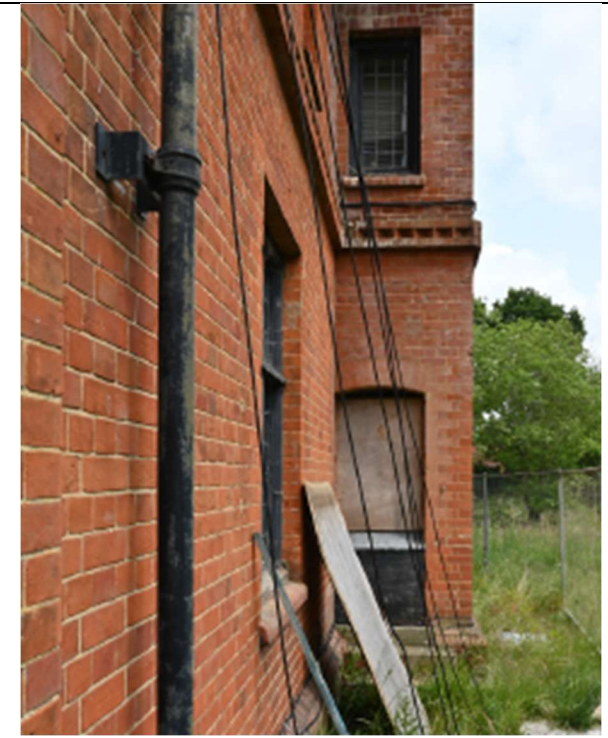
& 9 Single storey plant and cleaners rooms external facades
